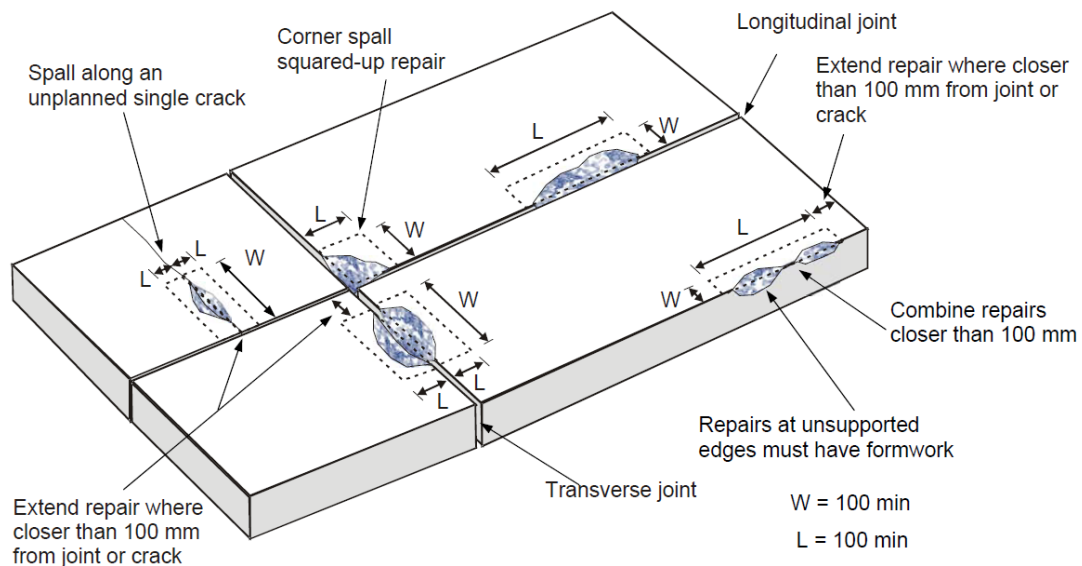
Typical shape and configuration of spall repairs (Not to scale)
